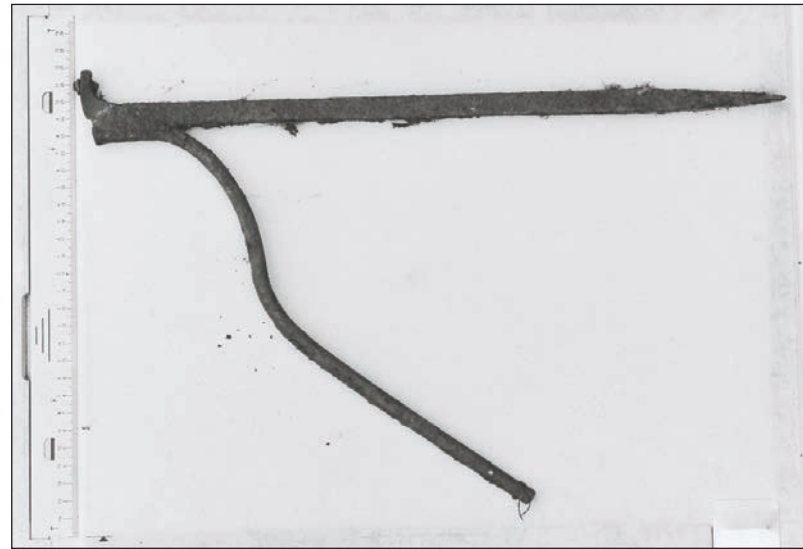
Detail of iron gutter bracket (removed) from the south elevation of Building 2 (Film 06.18)
